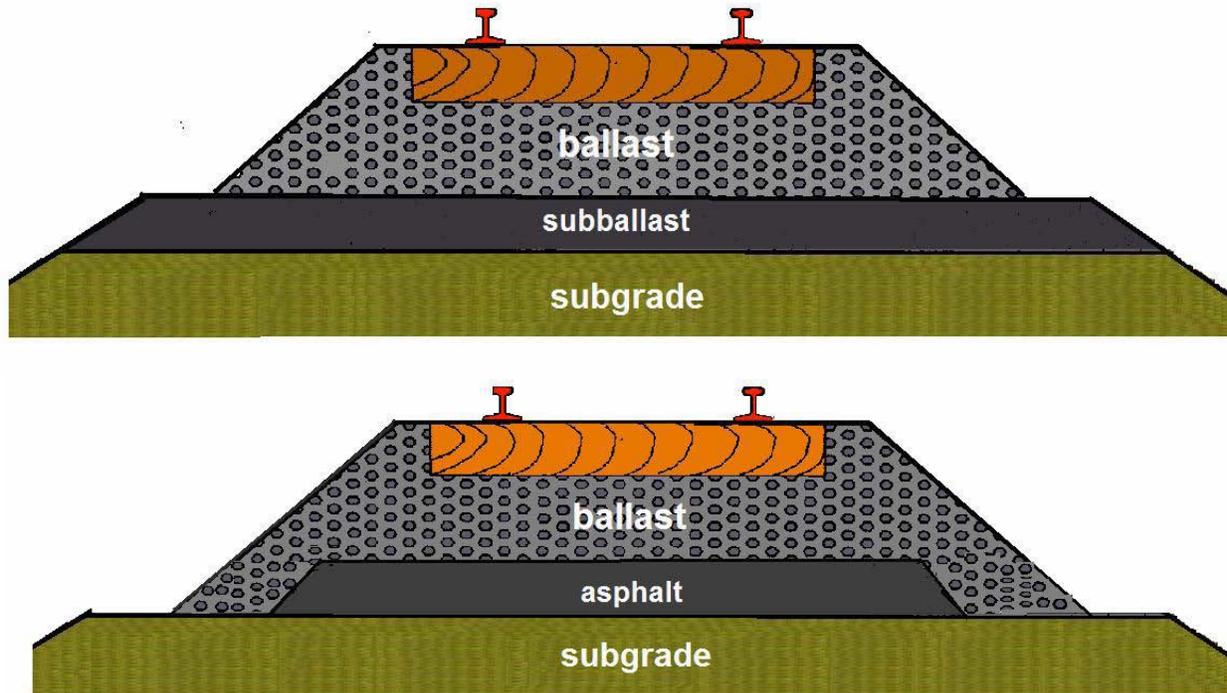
Cross-sectional views of typical all-granular and hot mix asphalt trackbeds.
